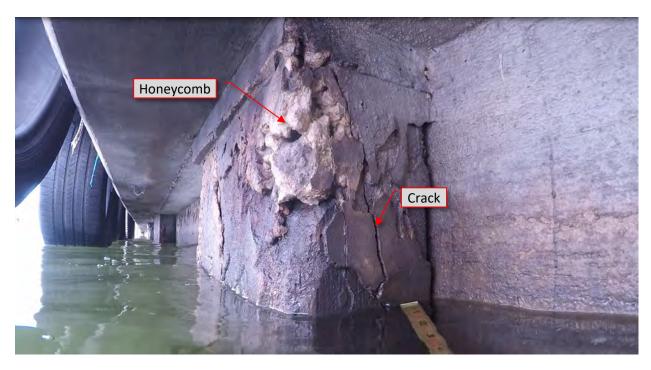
P18. STA 3+71. Crack at east flange at pile. Honeycomb area.
